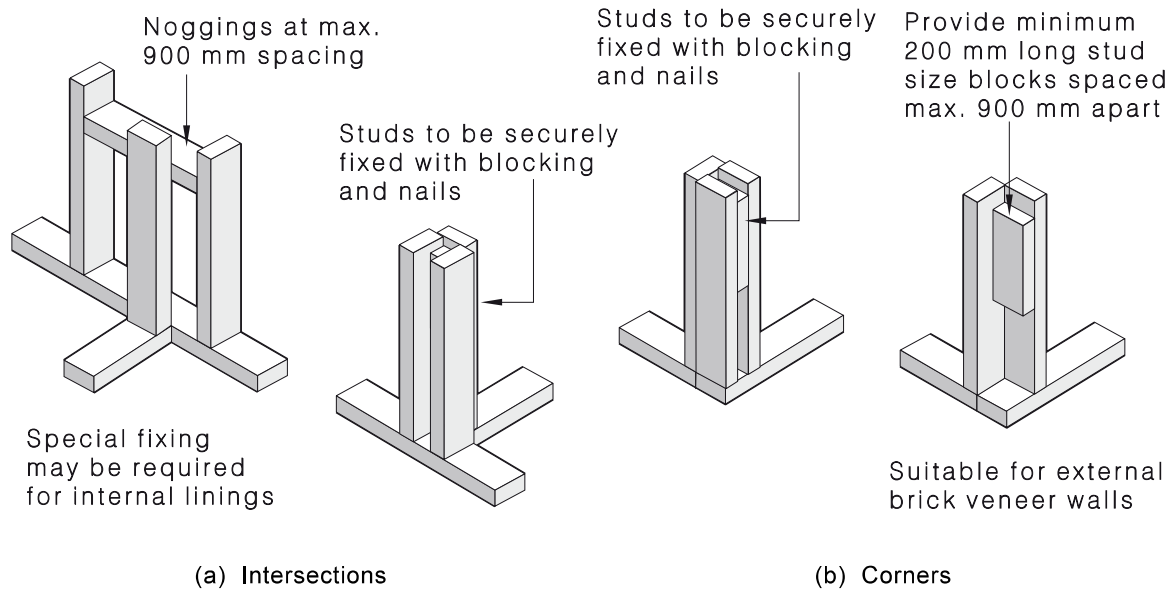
TYPICAL WALL JUNCTIONS
